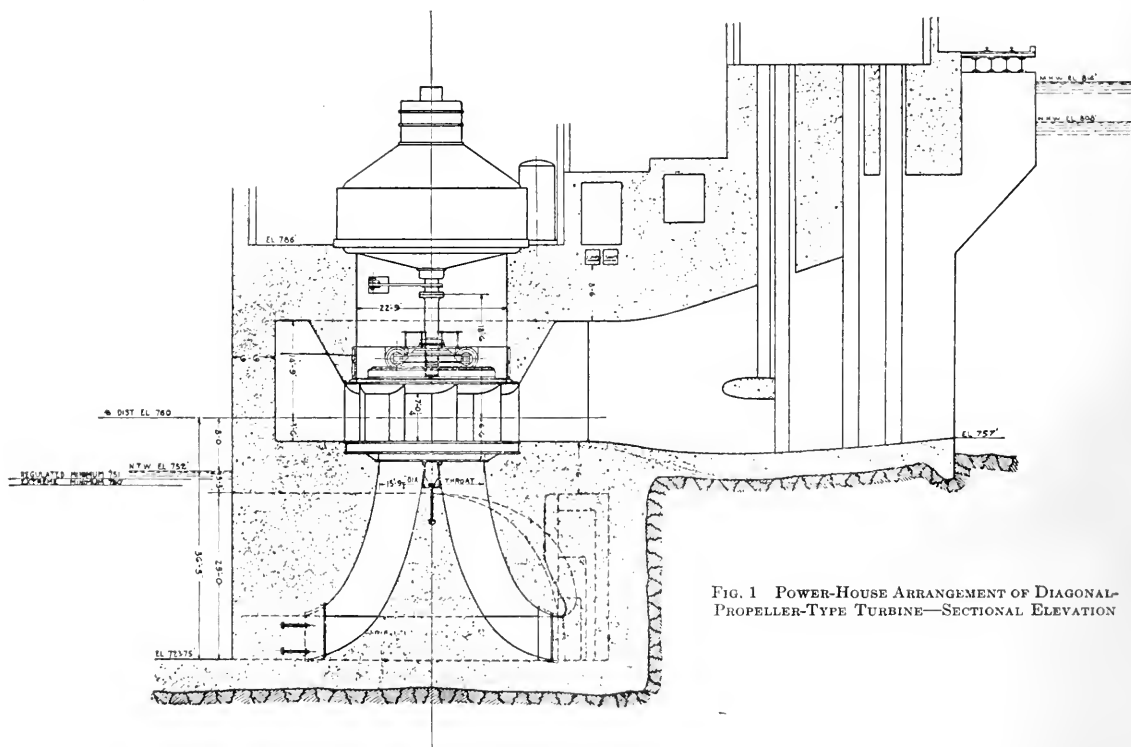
POWER-HOUSE ARRANGEMENT OF DIAGONAL-PROPELLER-TYPE TURBINE—SECTIONAL ELEVATION
